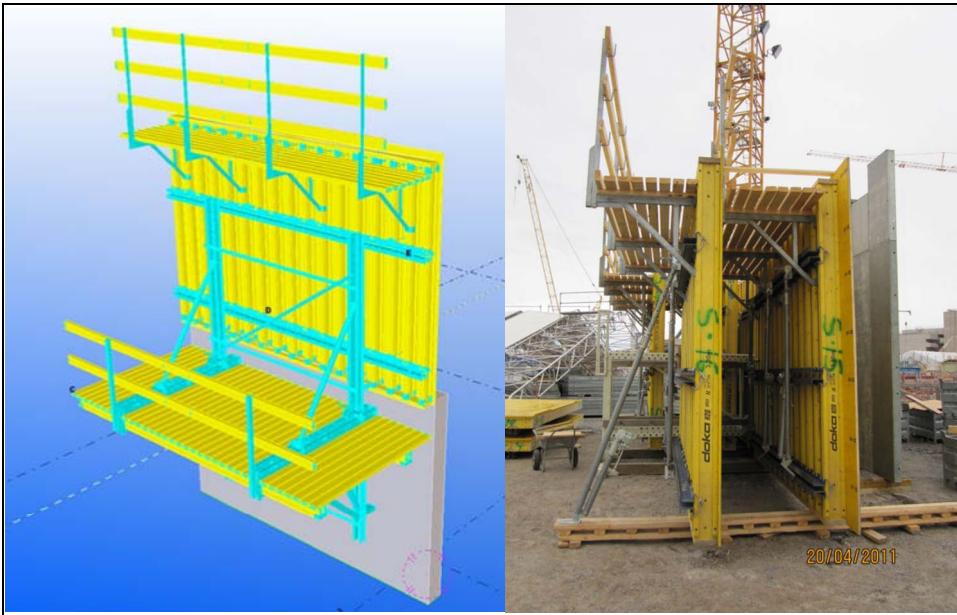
3D-wall-mould used in the technical test, and the real mould at construction site.
